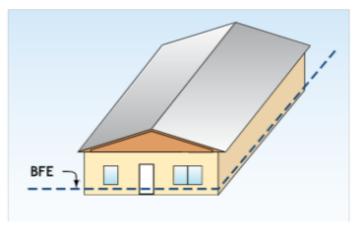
Elevating a house above the Base Flood Elevation can mitigate future flood damage
